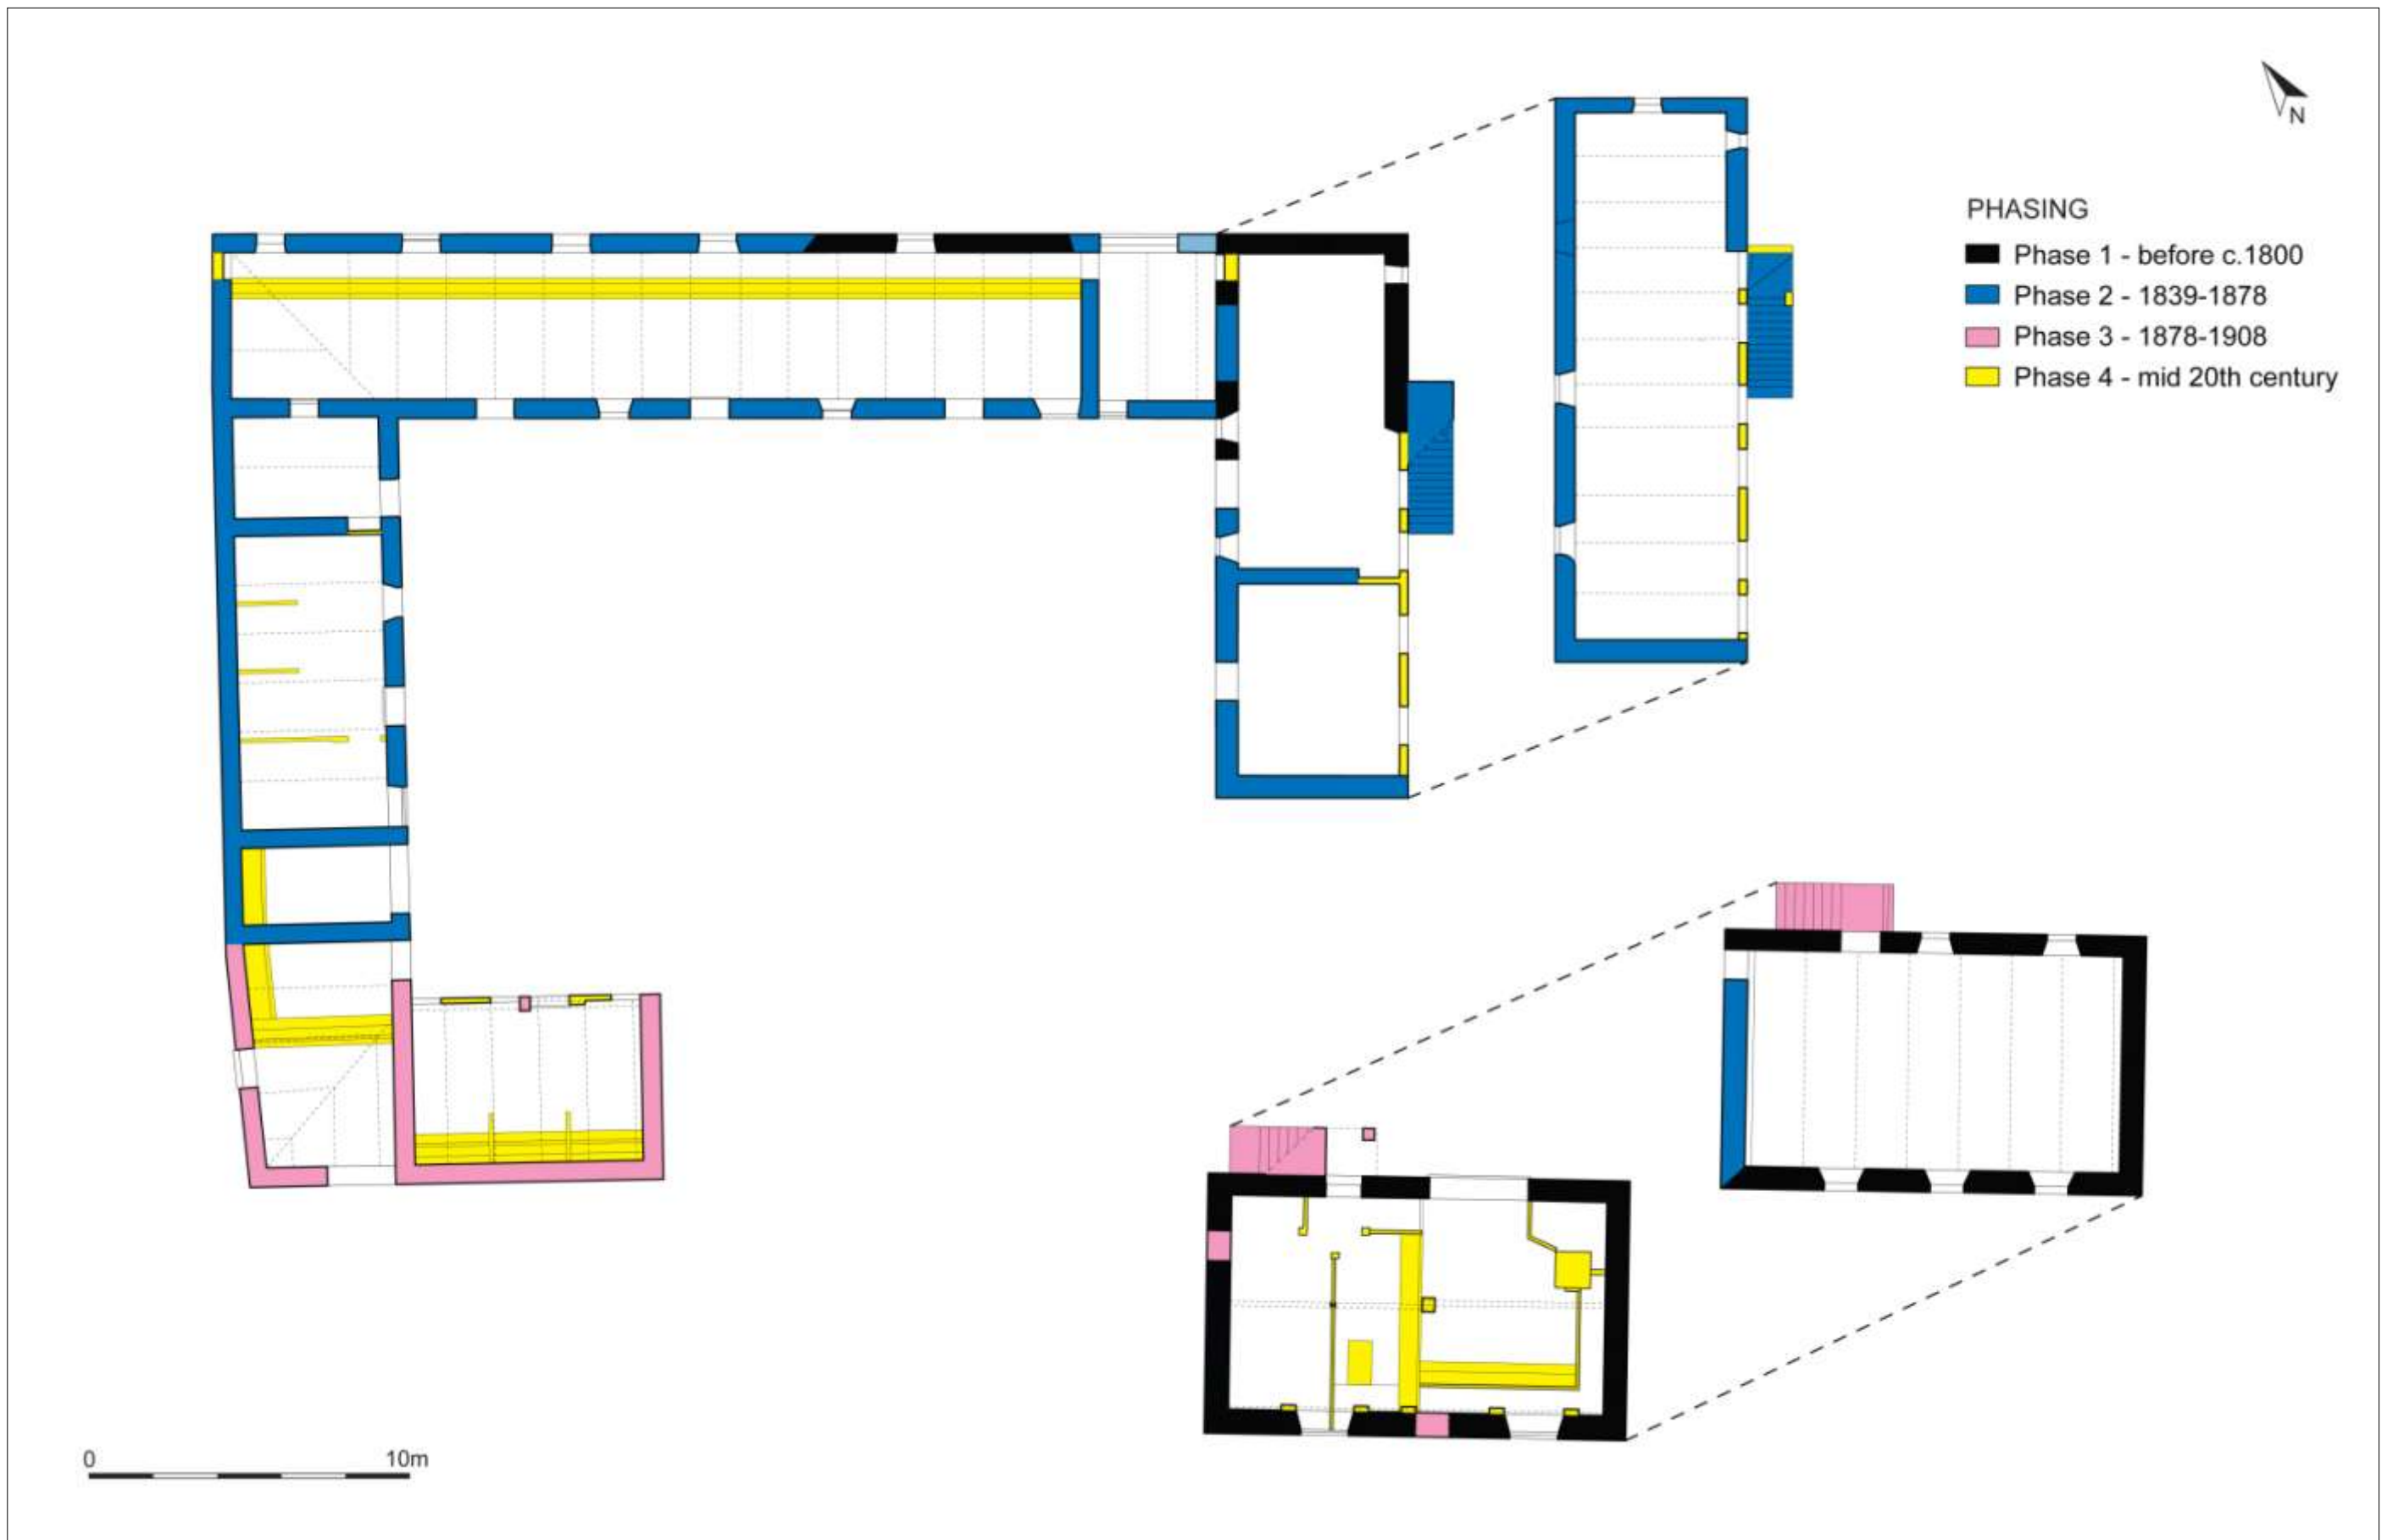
PHASE PLAN OF THE BUILDINGS. DRAWING BASED ON SUPPLIED PLANS.
